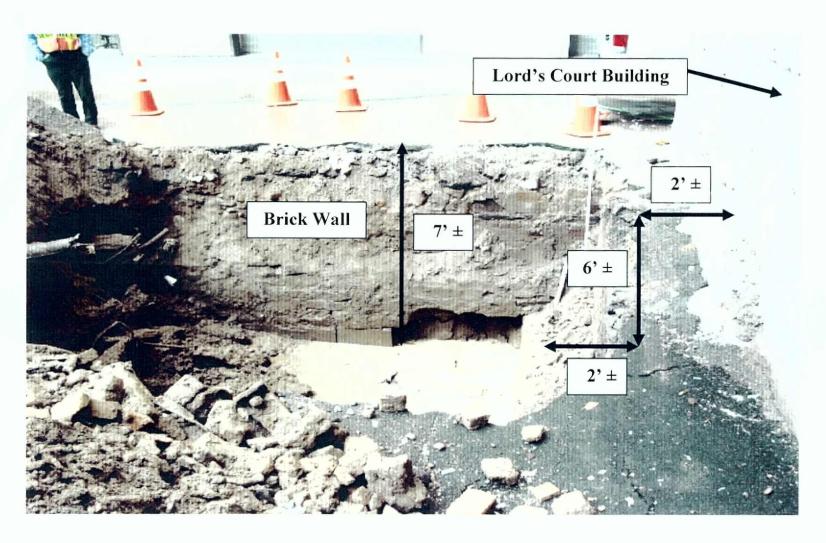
TP-10: Facing West-Bottom of concrete slab and brick wall (Possibly catch basin).
